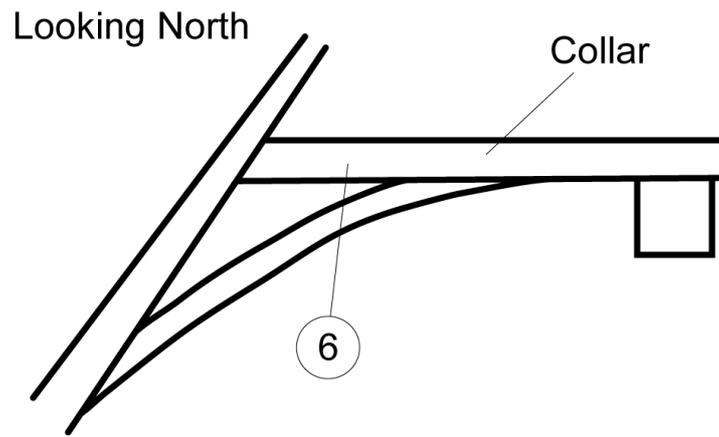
Sketch plan of the cross-wing roof showing the sample locations
